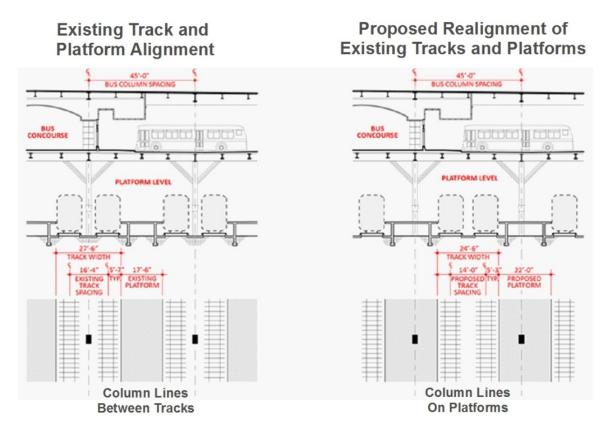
Constrained Rail Alternative 4—Maximize Overbuild Potential, Detail
